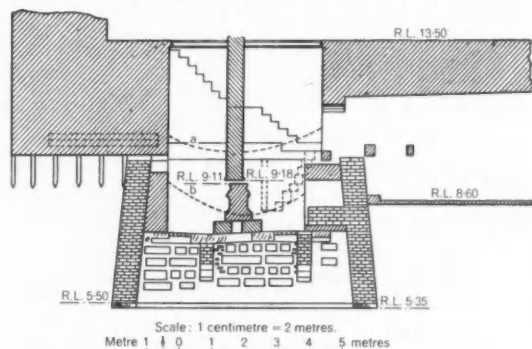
Sectional Elevation (from West to East) of Lower Half of Well as found in 1937.
